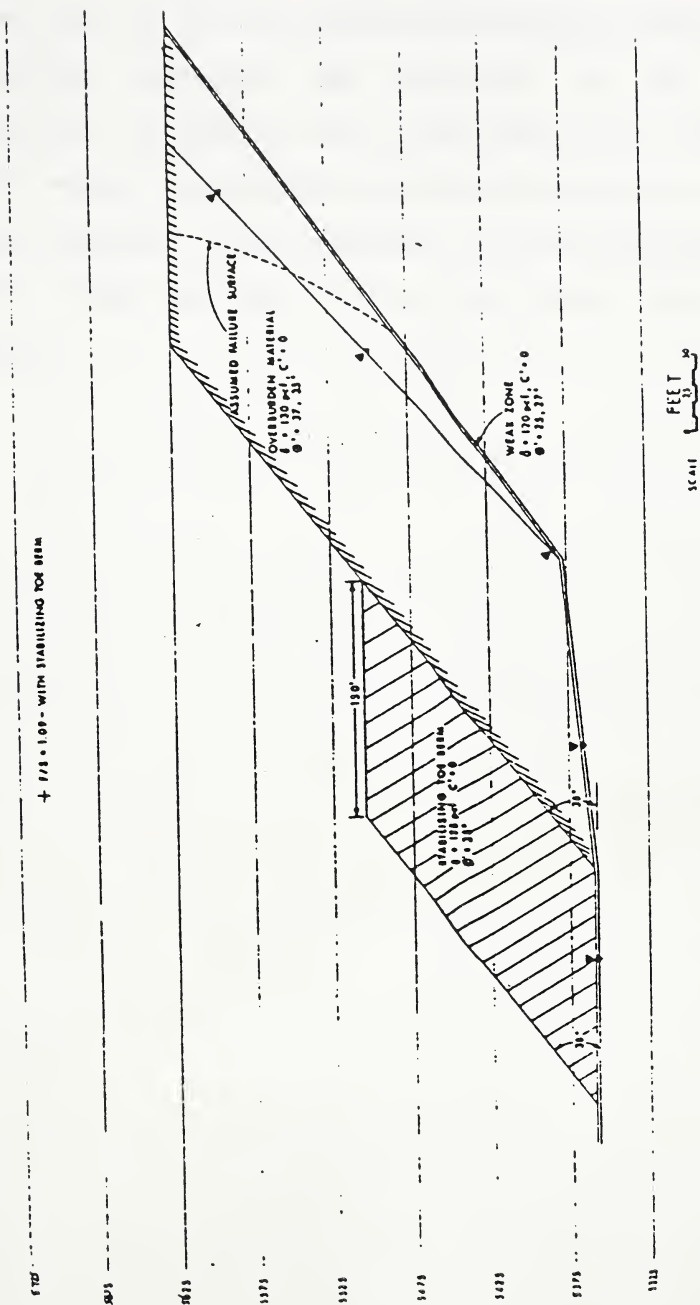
Stability analysis for north wall and stabilizing toe berm in 51-B-2 pit
